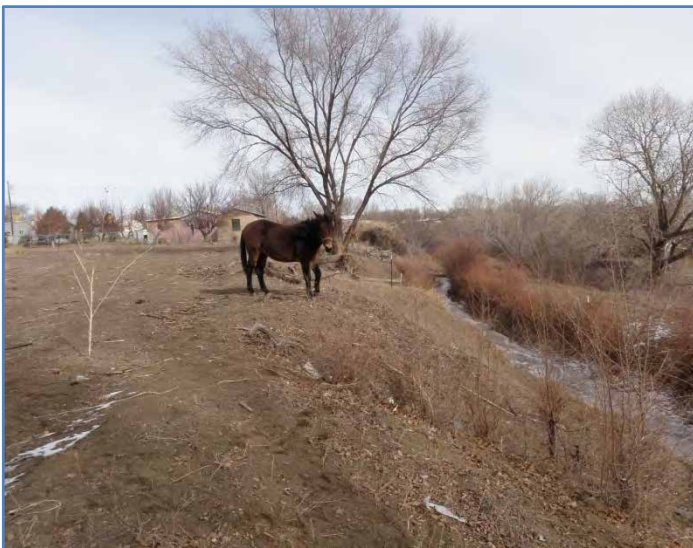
View of sewer alignment looking NE. Sewer alignment app. follows top of slope, EMD at right.
